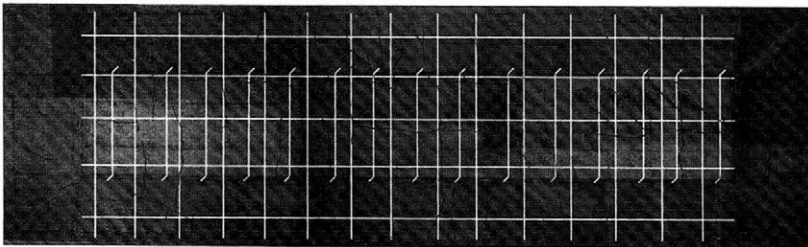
Superimpose image of the Slab with crack and bar arrangement
